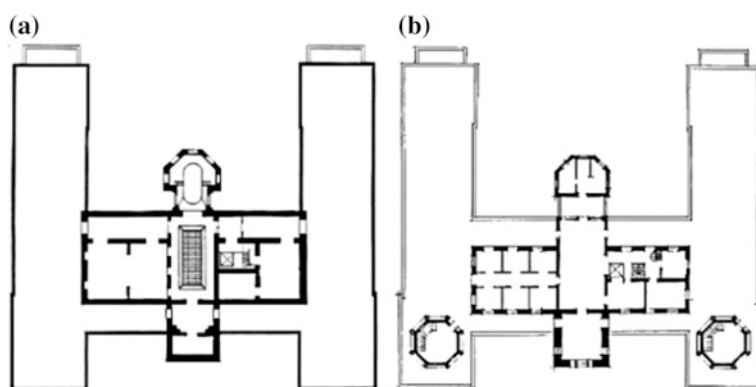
Pavilhão Mourisco's fourth-floor (a) and fifth-floor (b) plans, respectively
